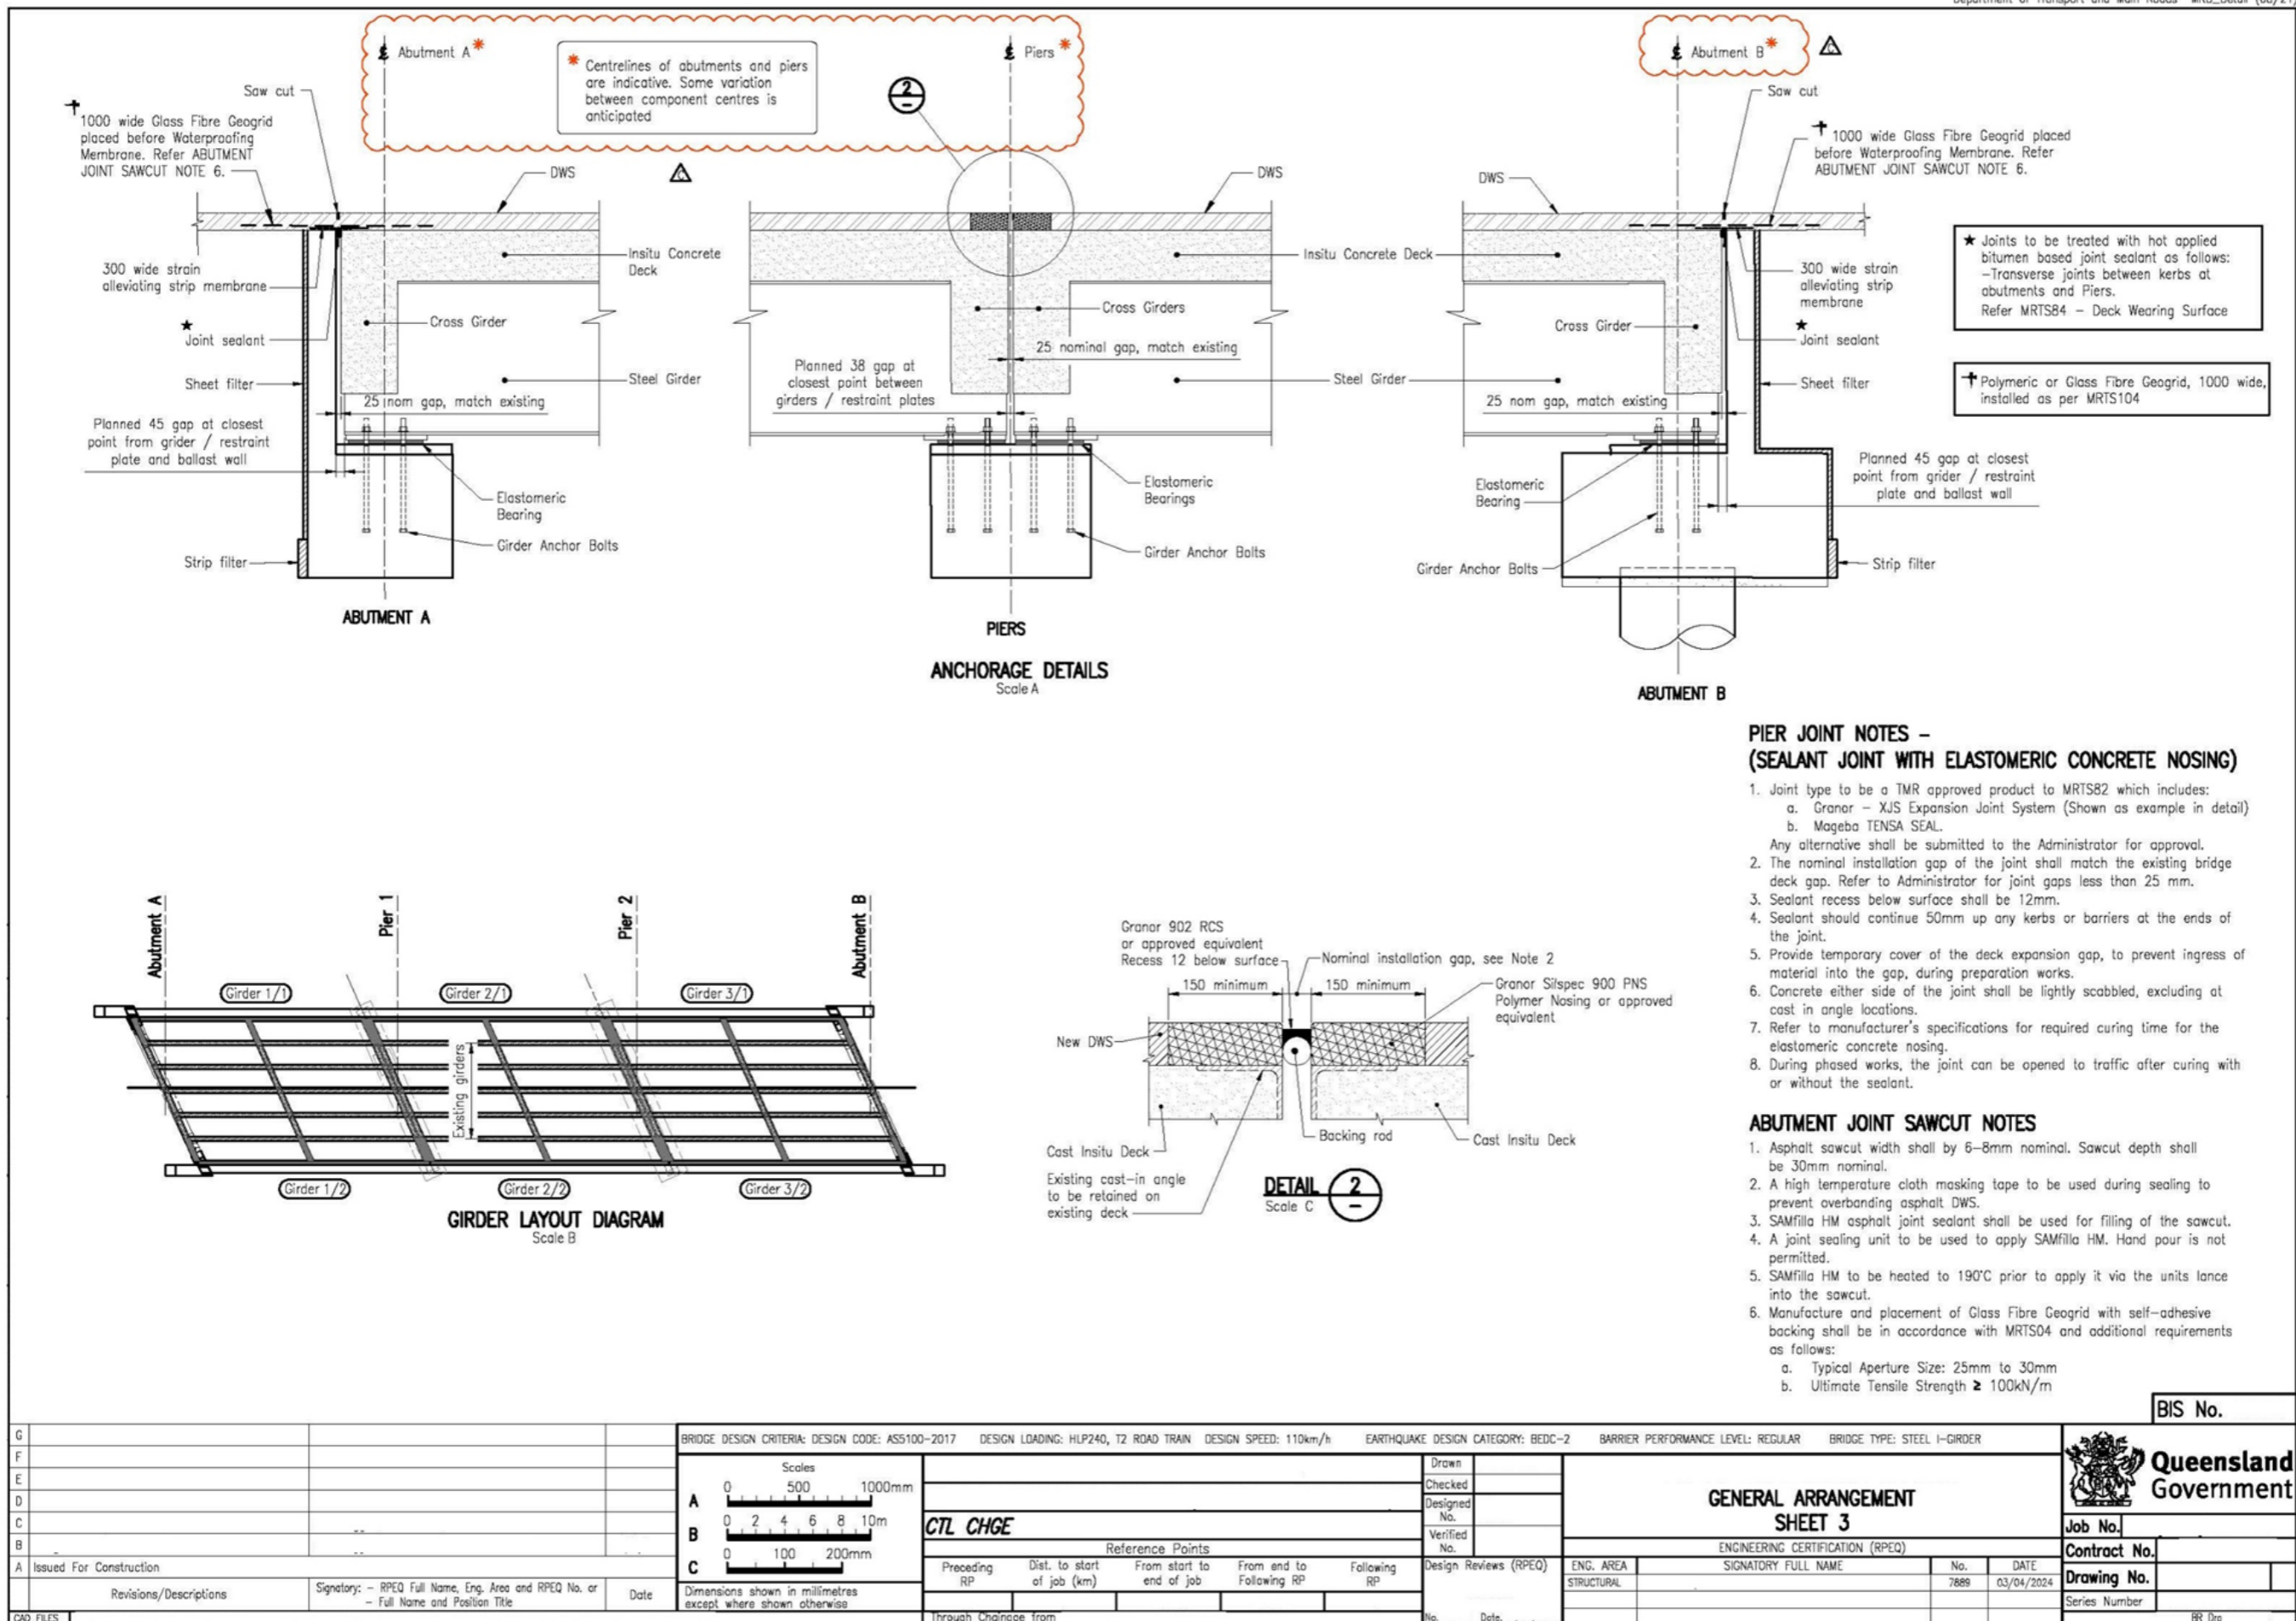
(I) – Steel I-beam drawings – widening of existing bridge – notes – Sheet 1
